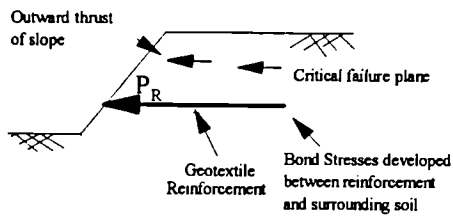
Application of bond between geotextile reinforcement/soil
